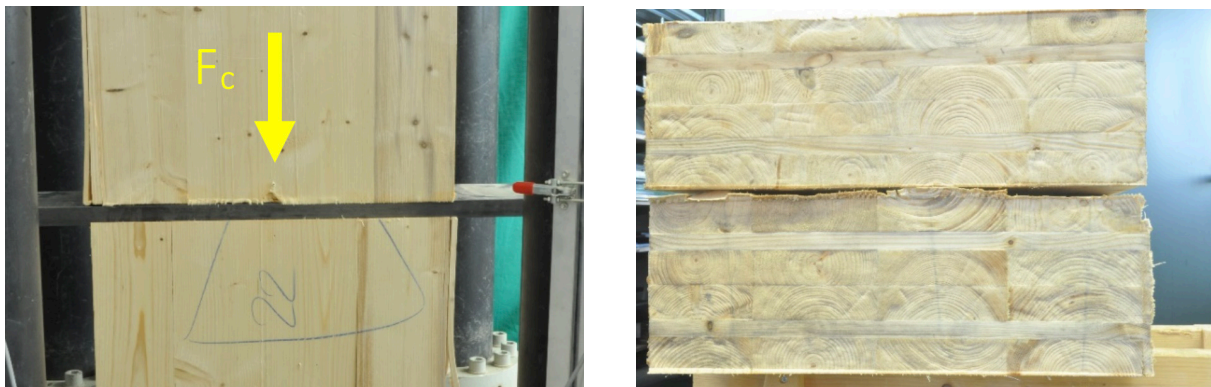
Typical failure of CLT specimens with steel plate in the contact joint CLT joint after failure.
